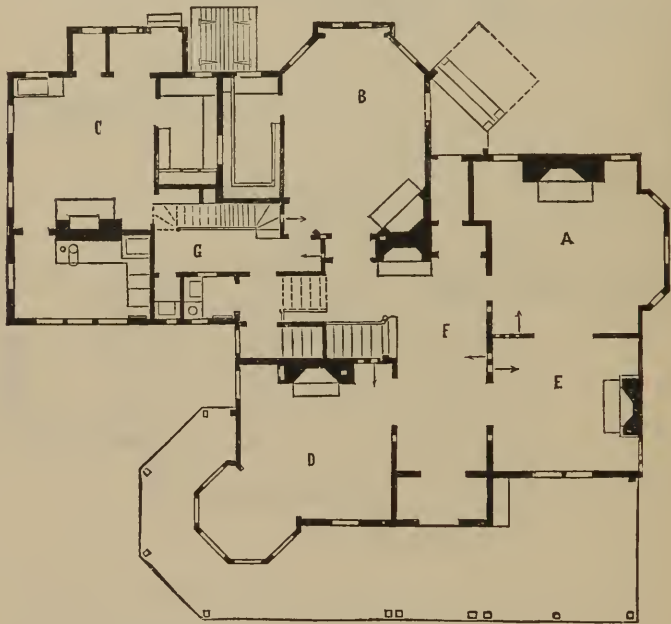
FIRST FLOOR PLAN OF SUBURBAN HOUSE.—(See page 64.)
